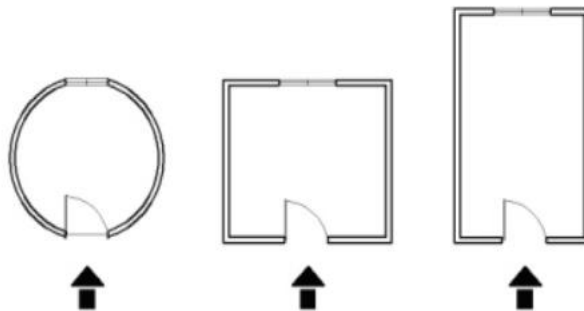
Placement of Openings in the Buildings, creating a flow path for water [61]
